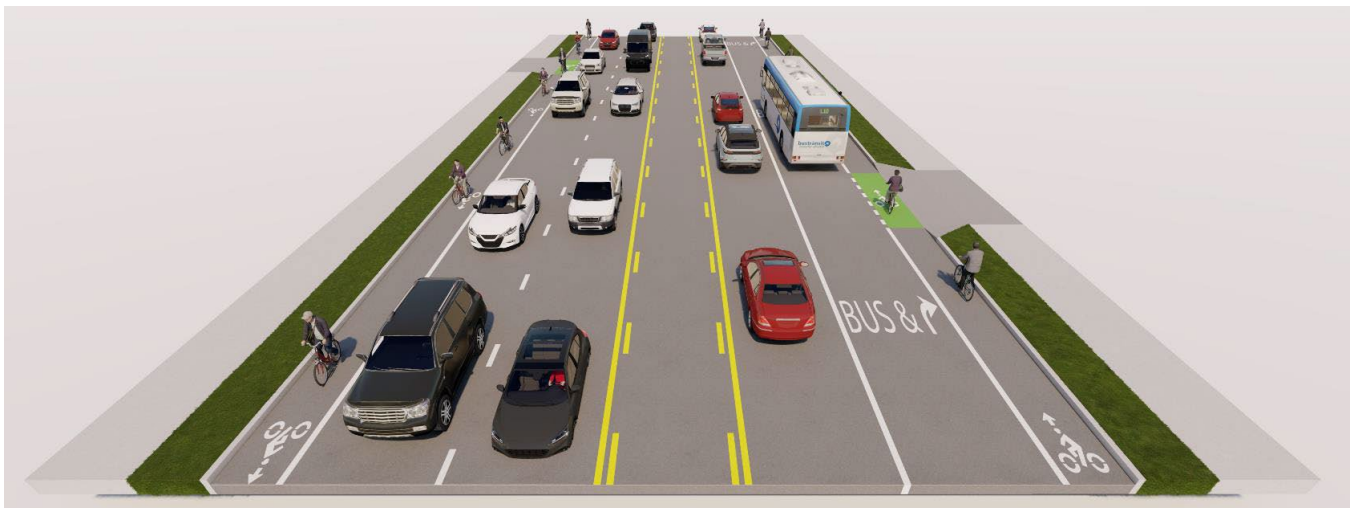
Alternative 1 – Stapleton Road to 62nd Avenue
